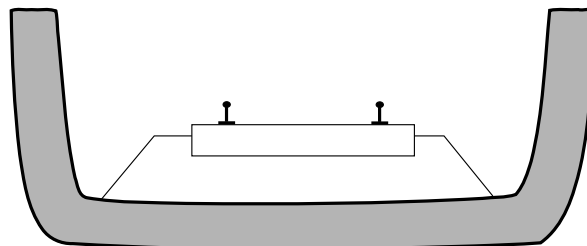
Sketch of shape of U shaped Trough bridge, with ballasted track shown inside
